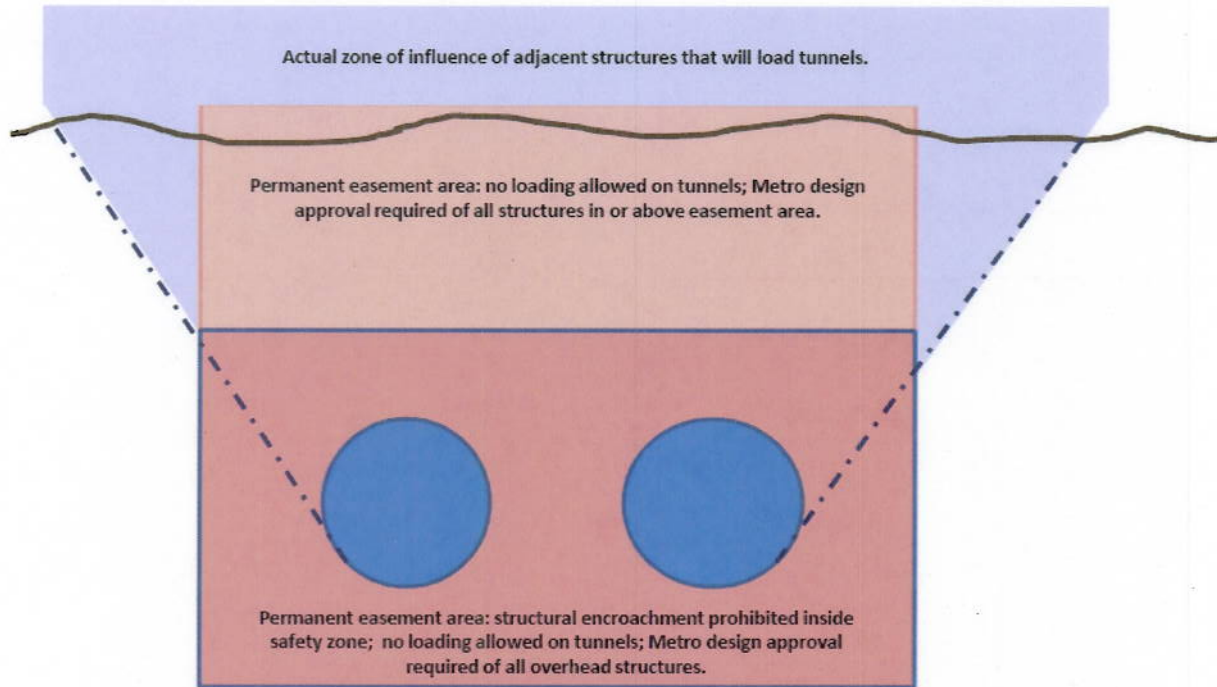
Typical Tunnel Cross Section and Zone of Influence
